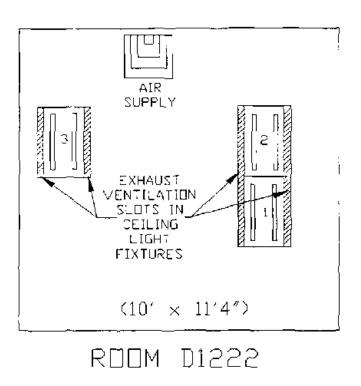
A Plan View of the Ventilation Sampling Areas and Room Layout
